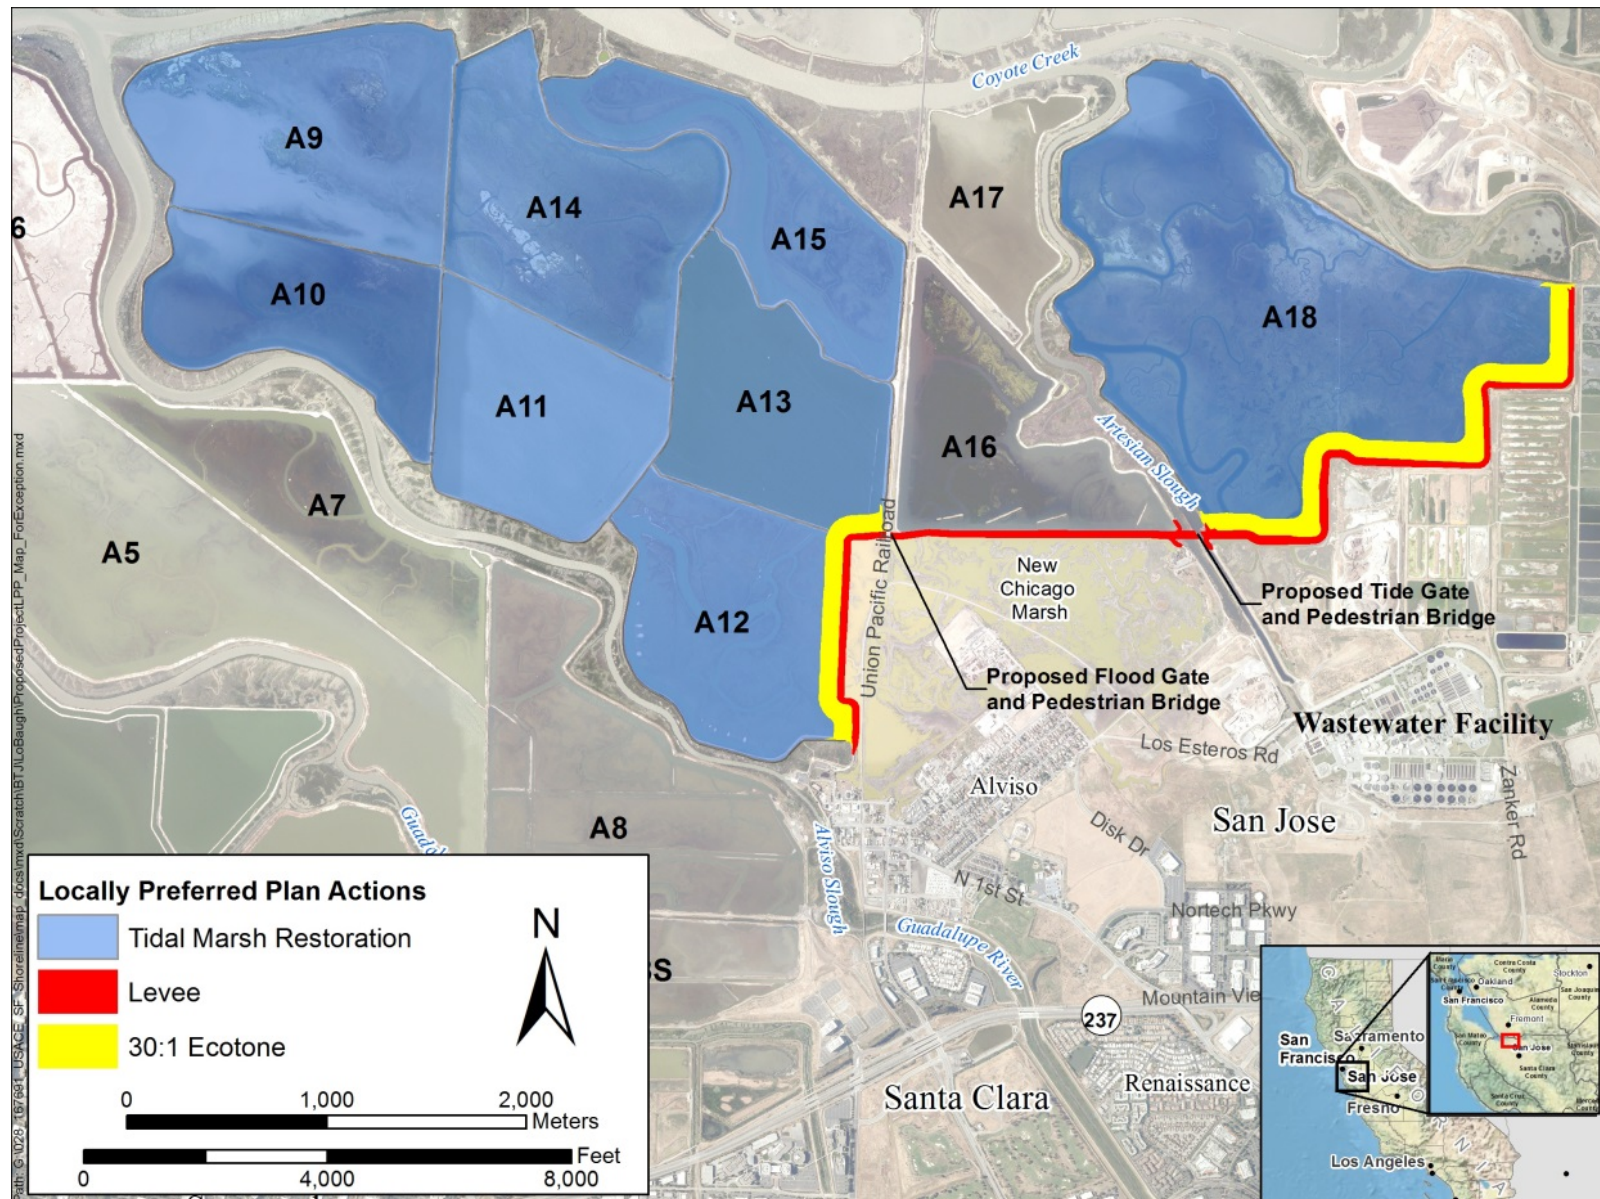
Recommended Plan (Alternative 3) Features
